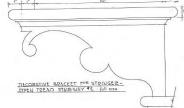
Stair stringer face design. (GWWO photo, 2005), and detail drawing.
